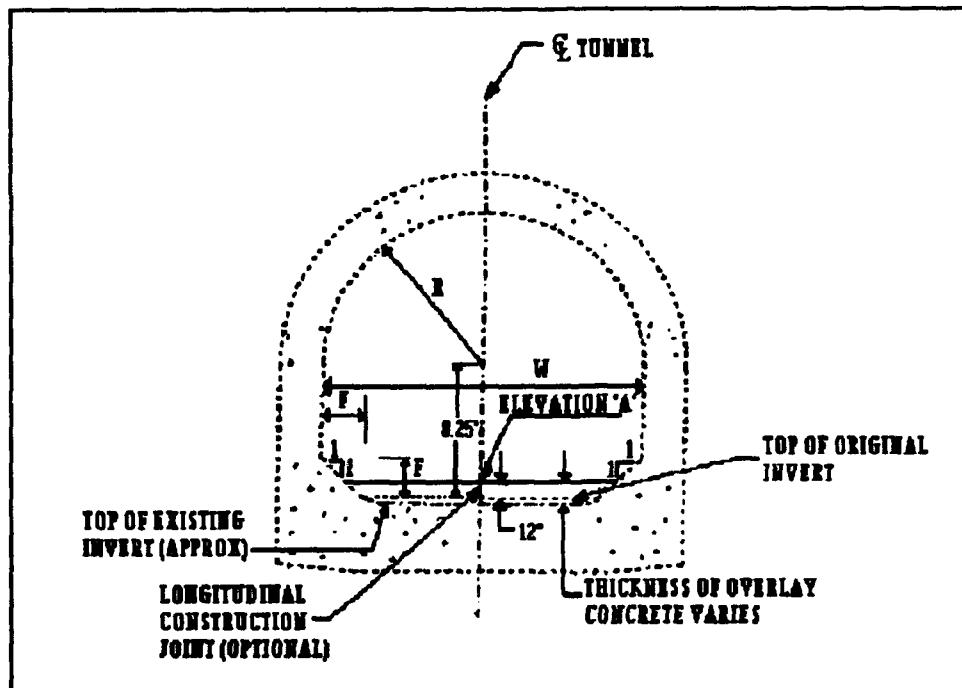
Typical tunnel section for overlay repair, Mojave River Forks Outlet Tunnel, 1990
